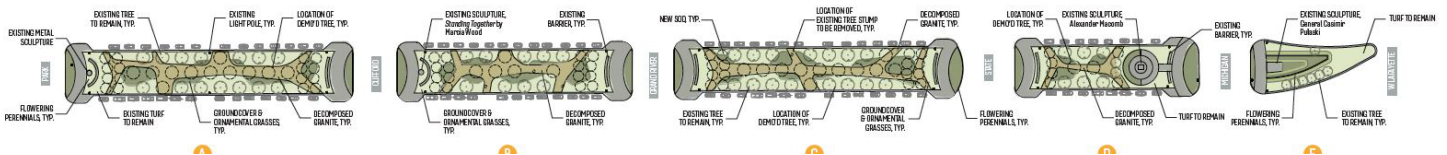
, by Applicant: Former proposal and NEW Proposed site plans showing pathway with trees to be removed/retained.
